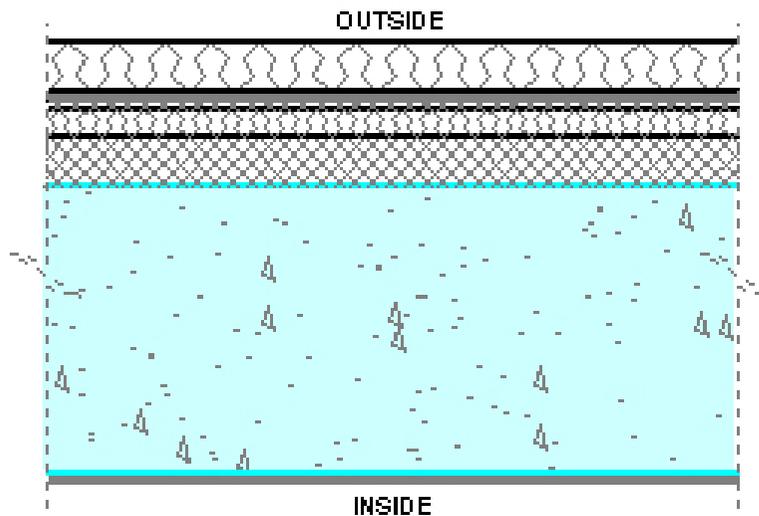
Detail Section - Boukunde II roof - RETROFIT PROPOSAL
